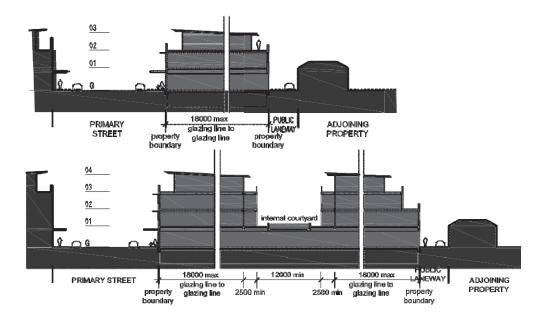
Waverley Development Control Plan 2012 - Annexure E 3-1 - examples of typical building section dual street frontage.
